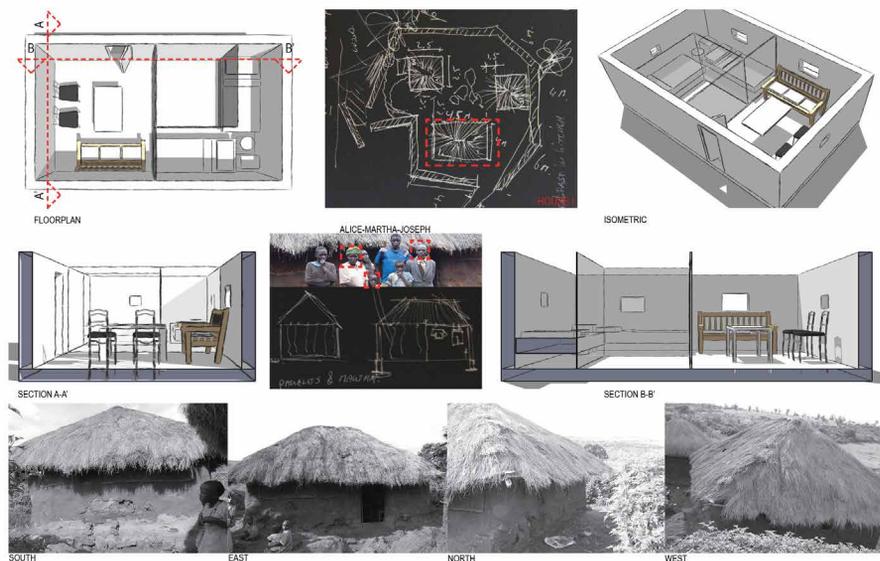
Inventory of the houses: floor plan, sections and facades (author: M. Smits)
